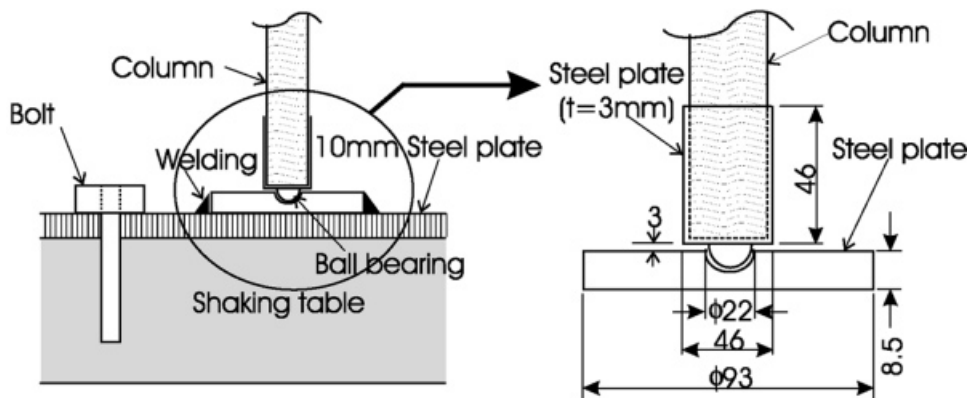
Detailed view of column-cornerstone connection used in model tests (unit: mm)
